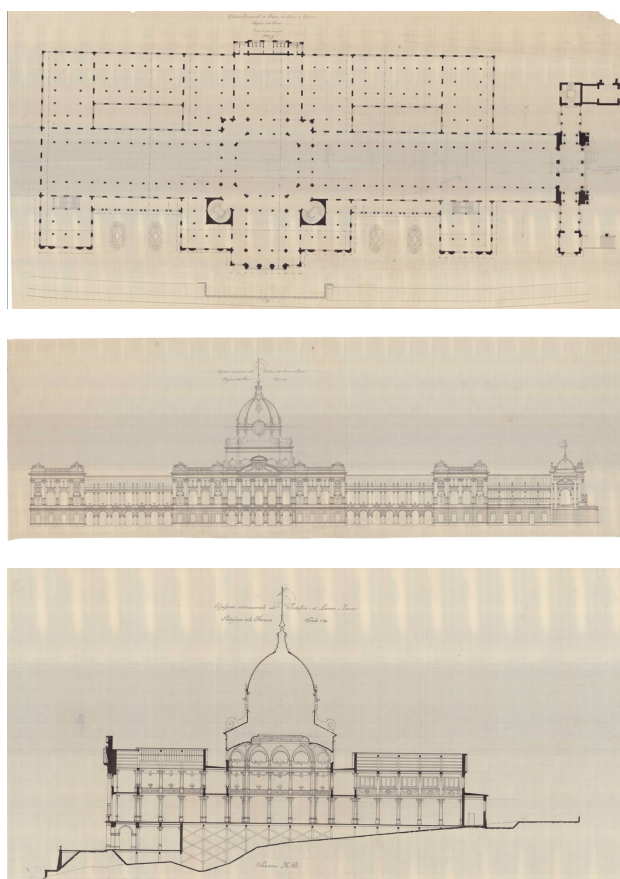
Pavilion of France plan, elevation, and section drawings, original scale 1:100 (Archivio Stefano Molli - Fondazione Marazza).
